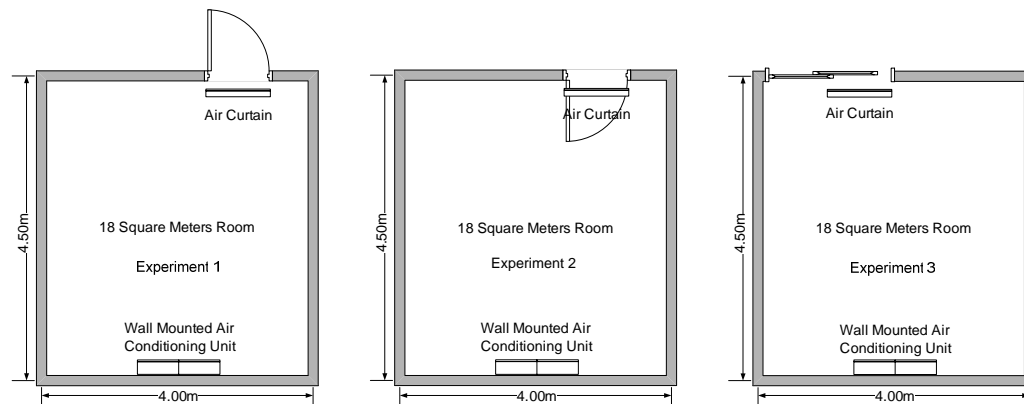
Floor Plan of Experiments 1 – 3: A Single Door with Air Curtain
